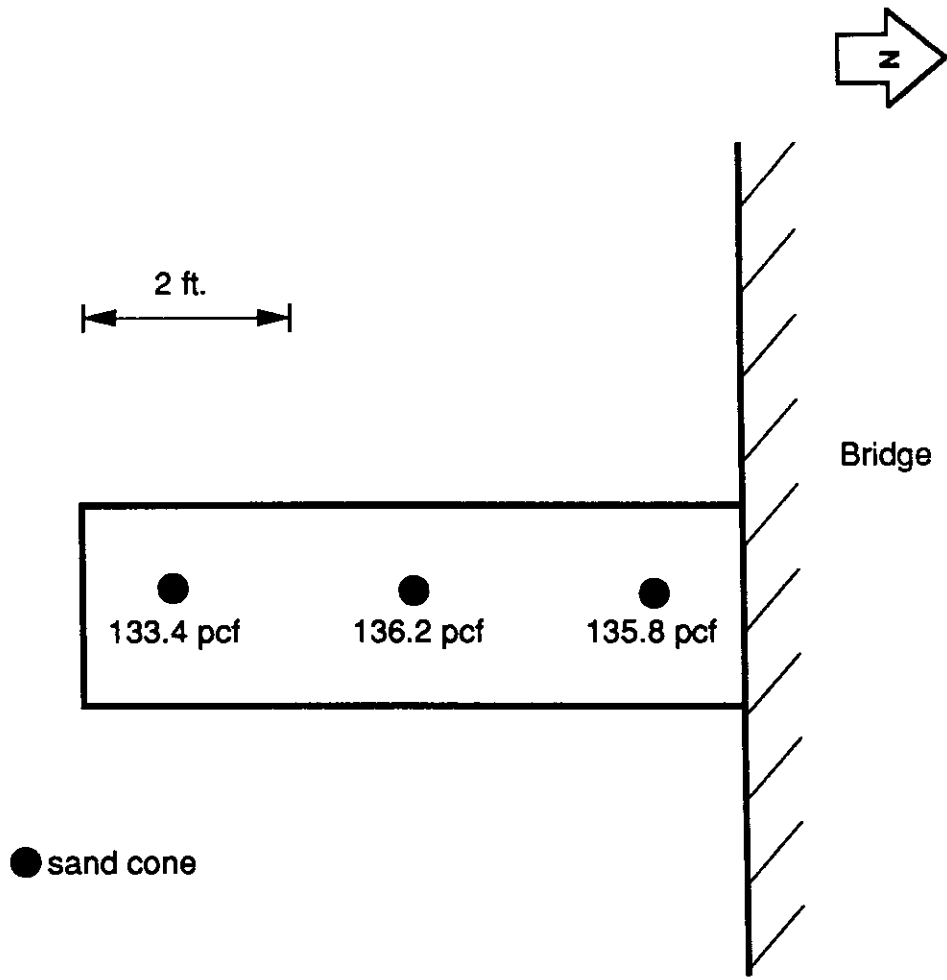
Dry Unit Weights for San Poil River Bridge (M.P.106) Fill Soils
